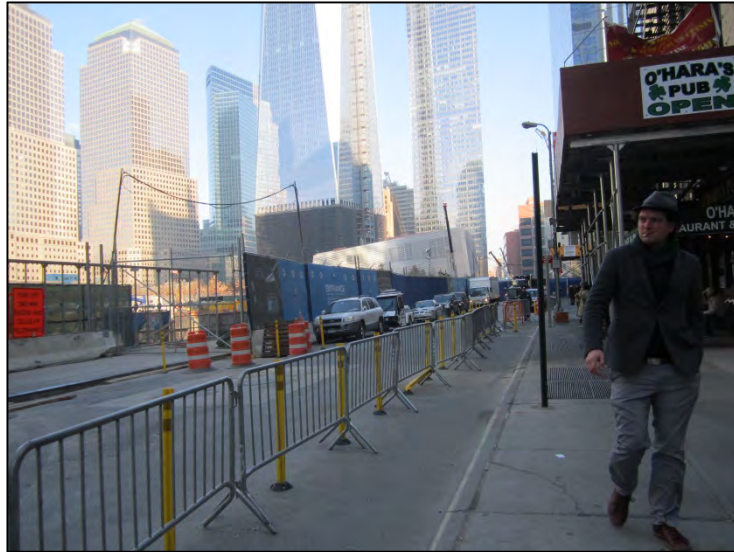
On-site portion of Church Avenue south of Dey Street and the west-adjacent World Trade Center construction site, view south.
